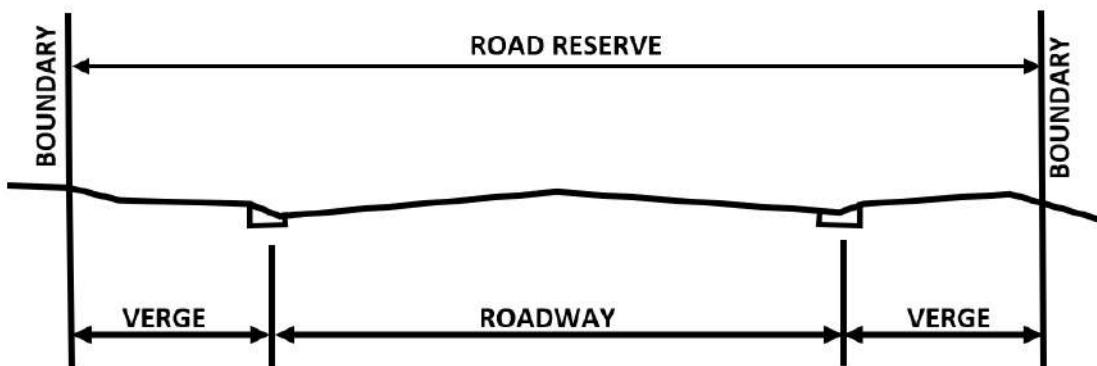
Recommended Cross Section for Class 4 Collector Streets
